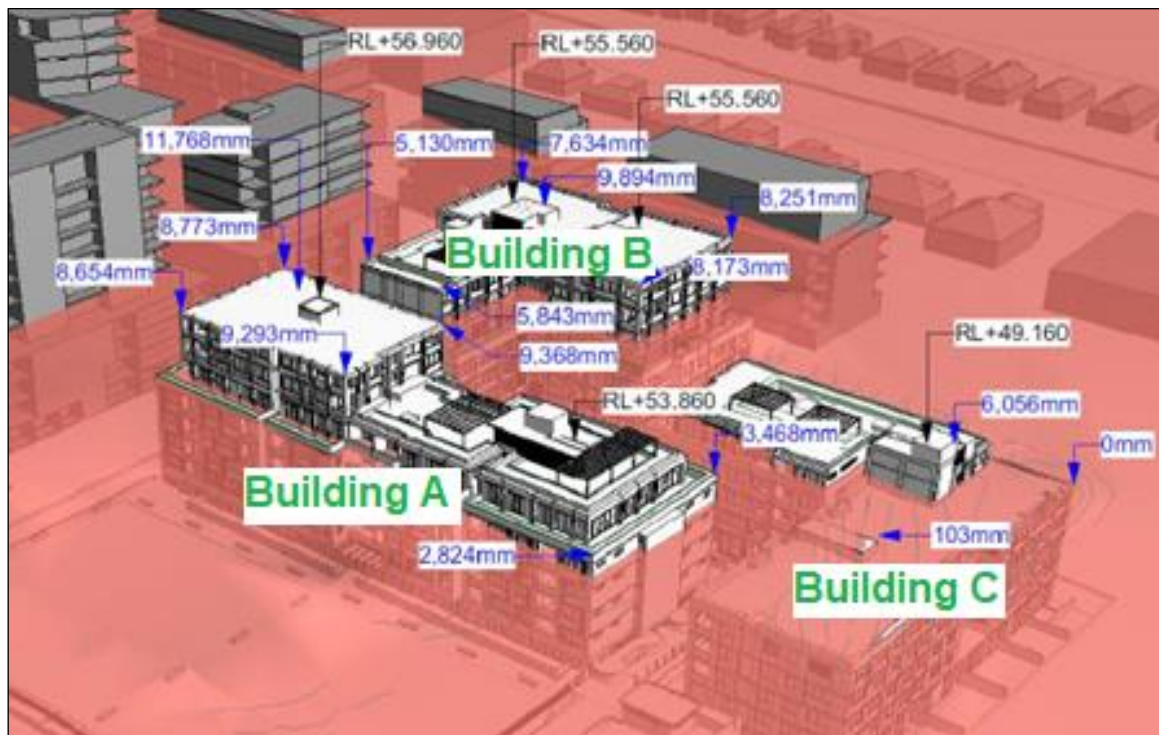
16m height blanket with protruding portions of the building above the maximum permitted building height shown in white.
